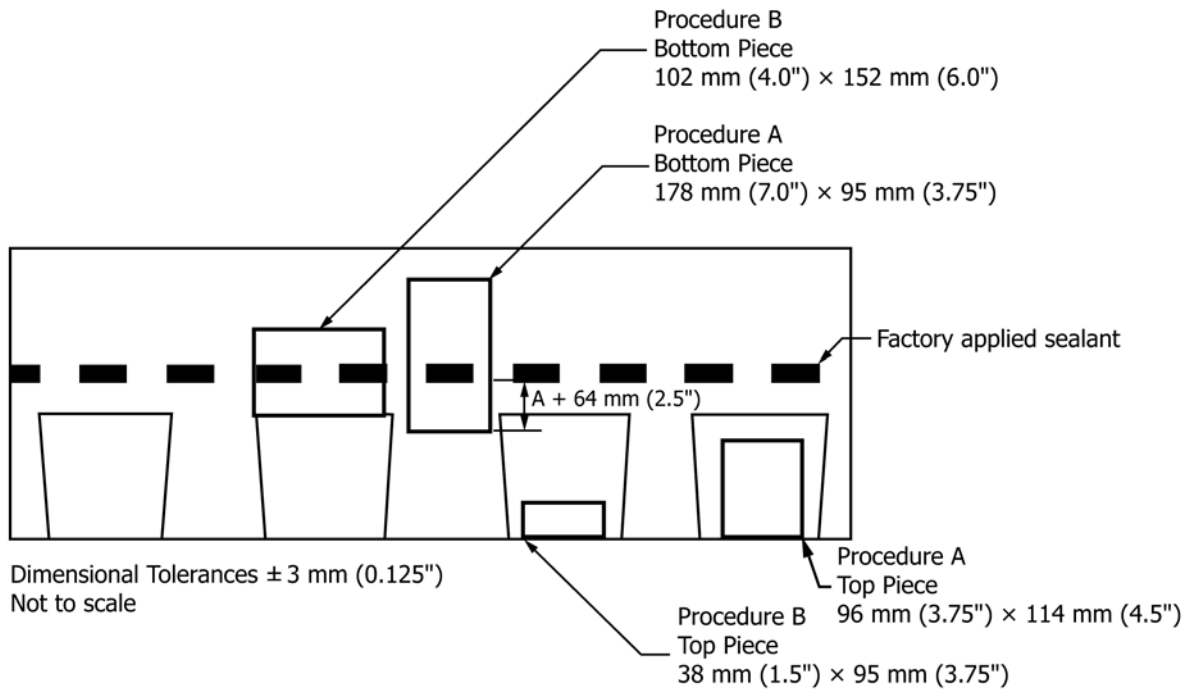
Plan View of Multi-Layer Shingle Showing Typical Specimen Locations
